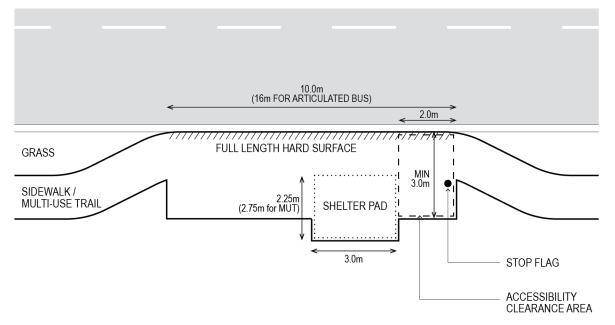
Typical Concept of Bus Stop with Additional Infrastructure – Boulevard width < 3.5 metres
